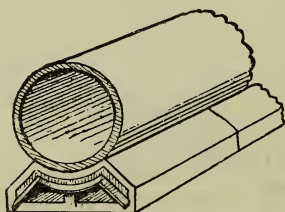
Brooks' combined Sewer-drain and Subsoil Pipe.
